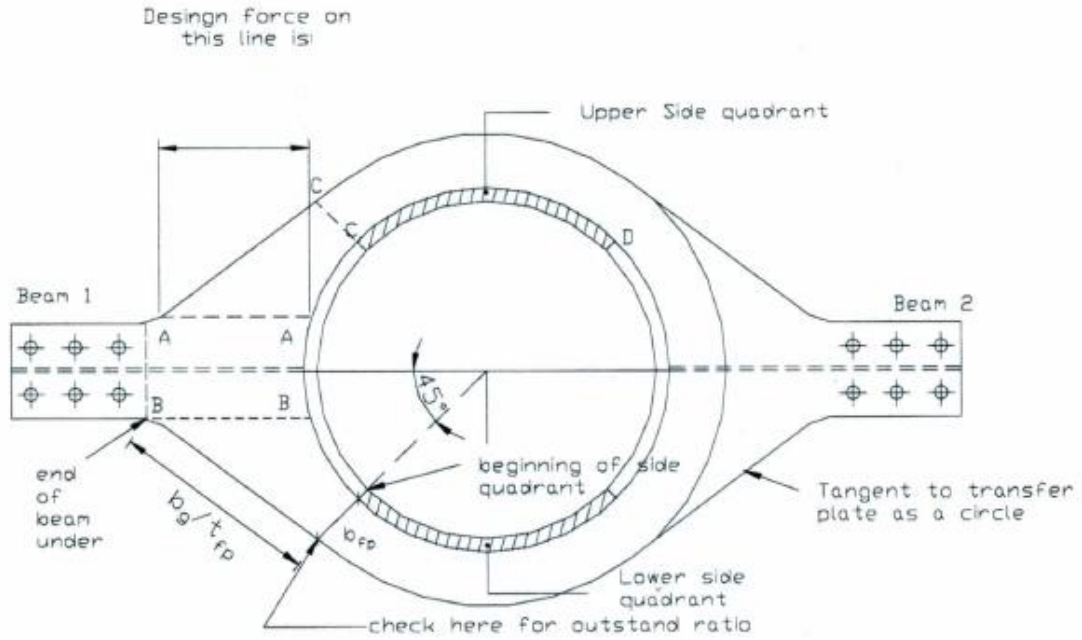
FBJ to CHS One Way Frame (Clifton, 2005)
